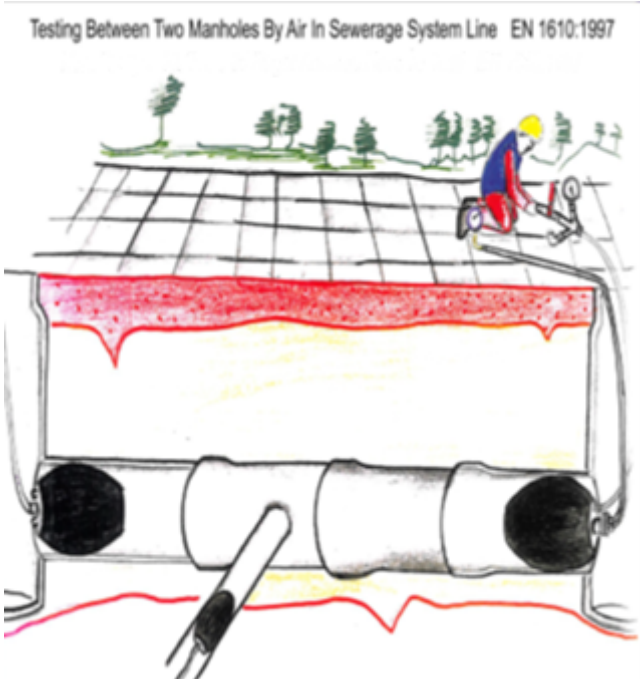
Non-destructive testing of sewer pipe by air (Surce:www.fabcob.com/fotogaleri.php).
